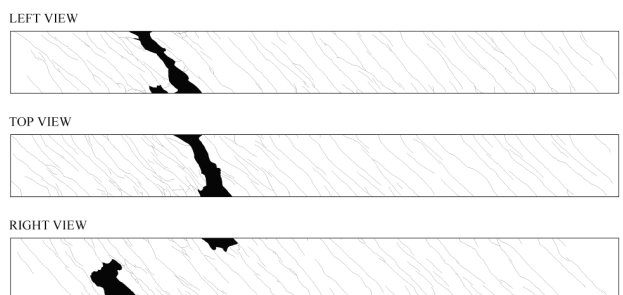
Cracking pattern: Beam E-0.75-5.4-0.76
